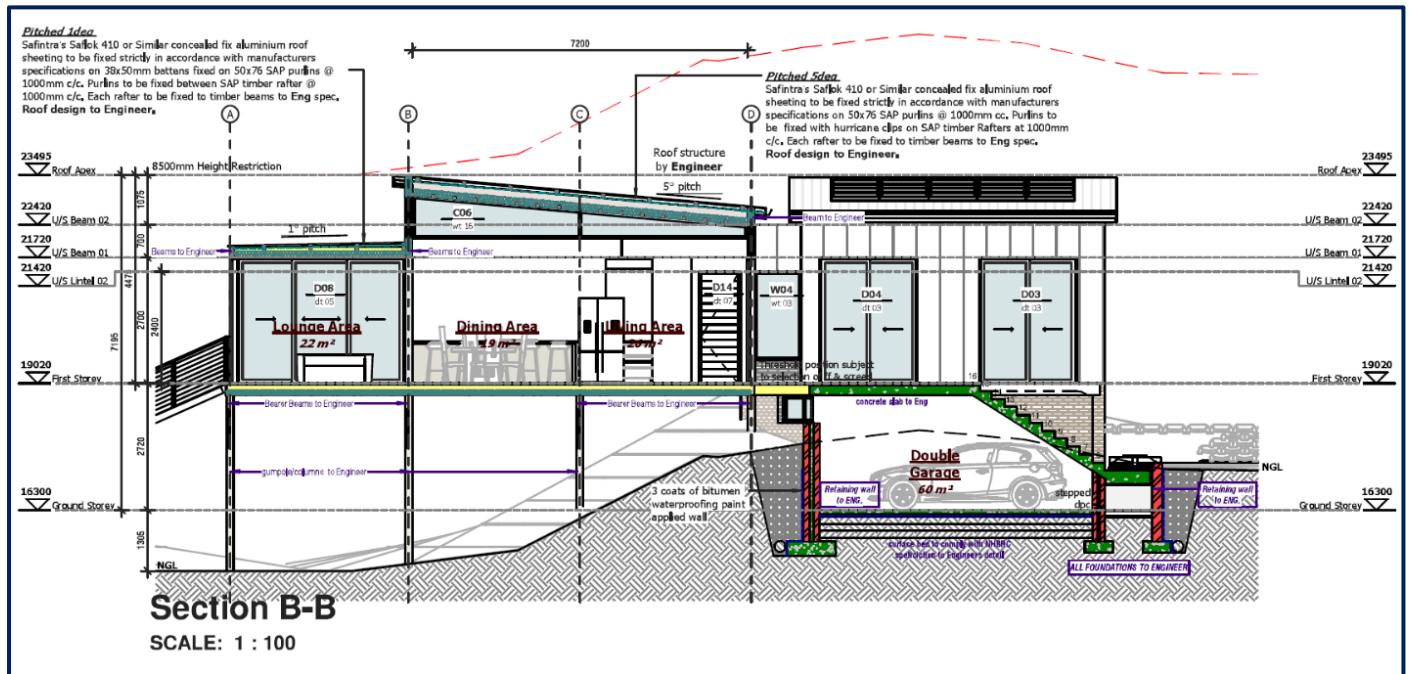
Concept Design and layout of the proposed dwelling on erf 1363 (Pure Design ;January 2023) (Refer to Appendix A)
